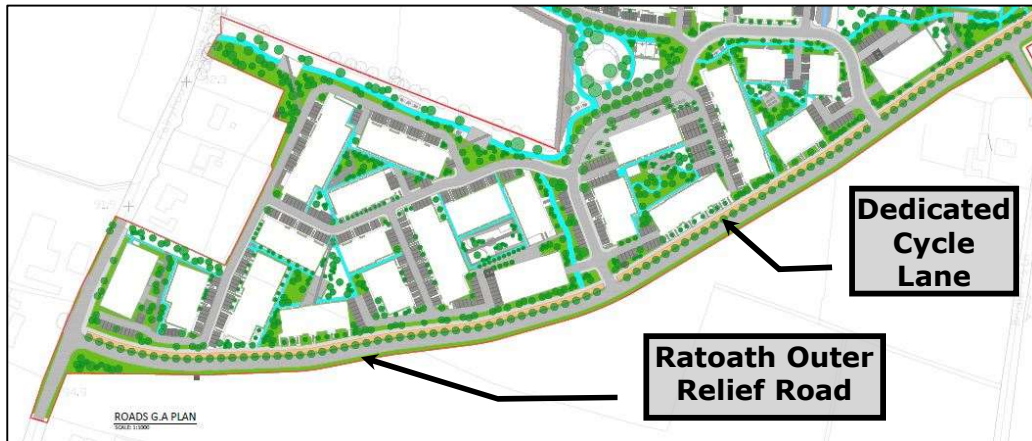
Additional Cycle Facilities on Ratoath Outer Relief Road
